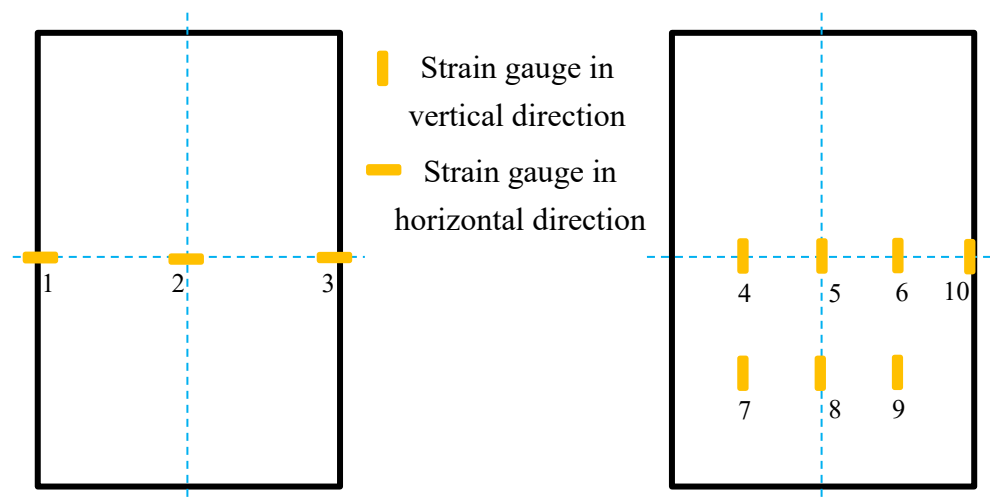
Arrangement and numbering of strain gauges in the stub column specimens (elevation view)
